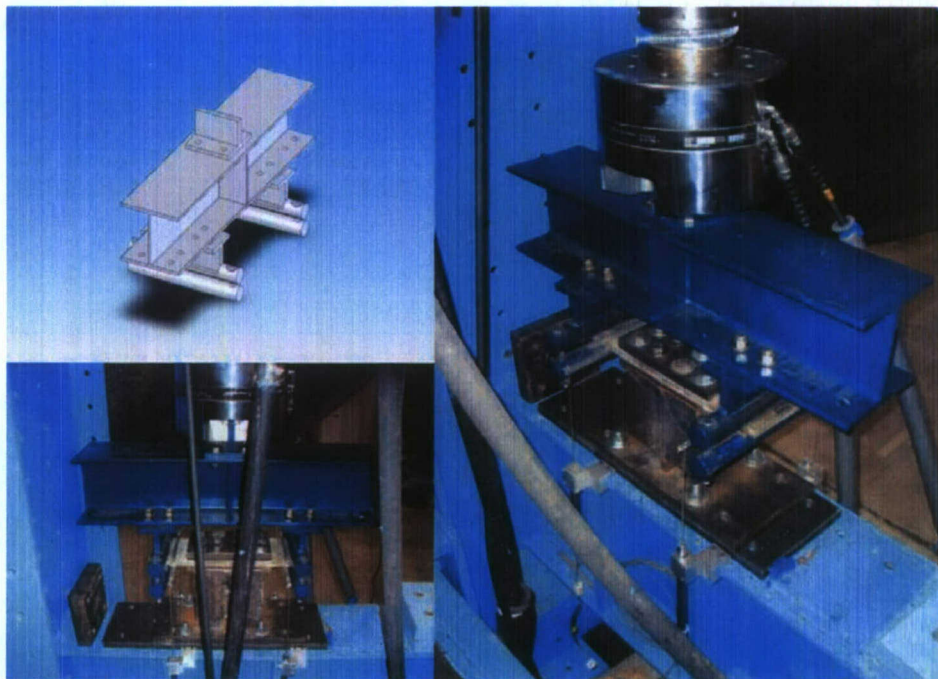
Front View of Actuator, Fixture, and Joint Assembly
